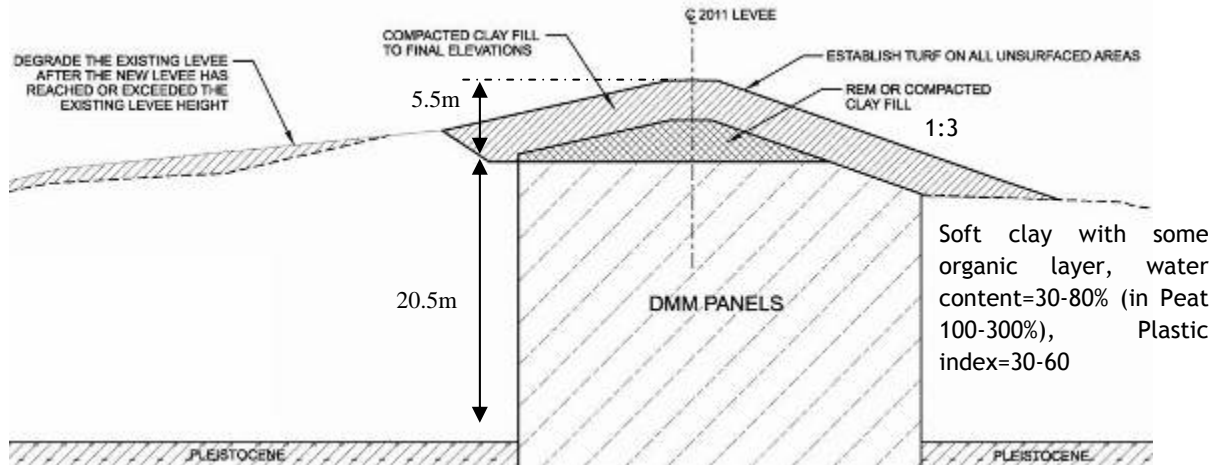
Typical Cross Section (REM: Recycled Embankment Material which is the cement/soil spoil from the Deep Mixing)
